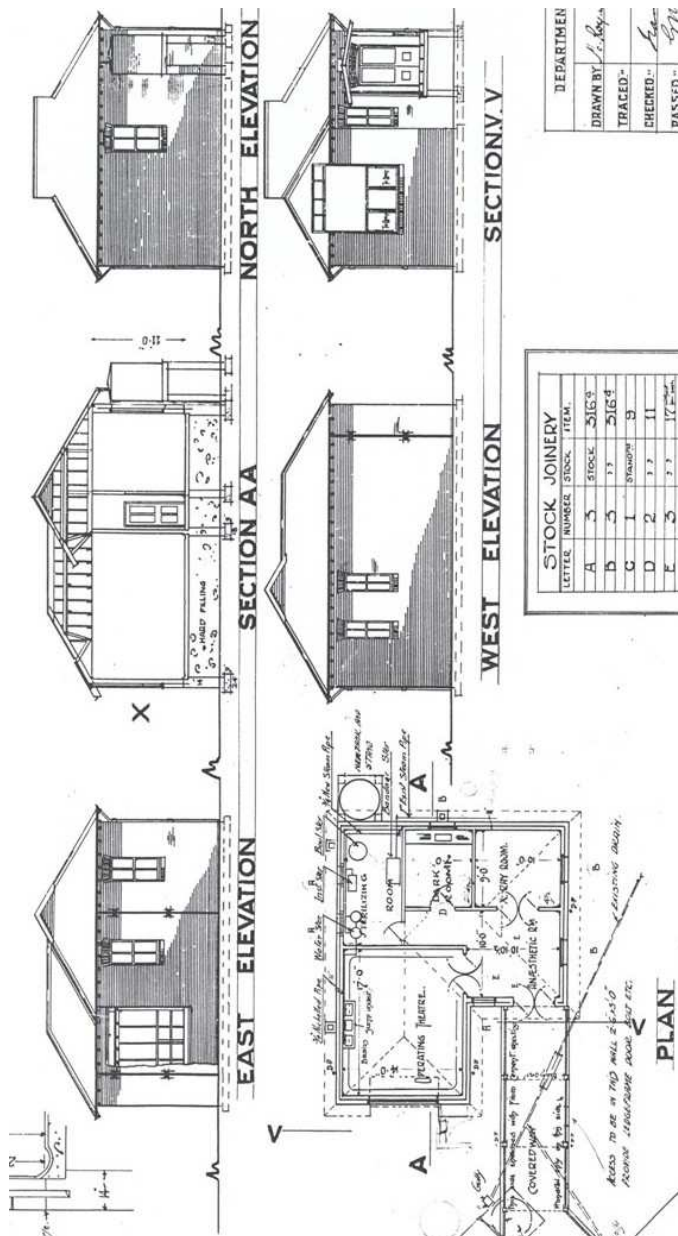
The Plans of the Hill Operating Theatre dated September 1916. (Source – OPWS Plan Room)
